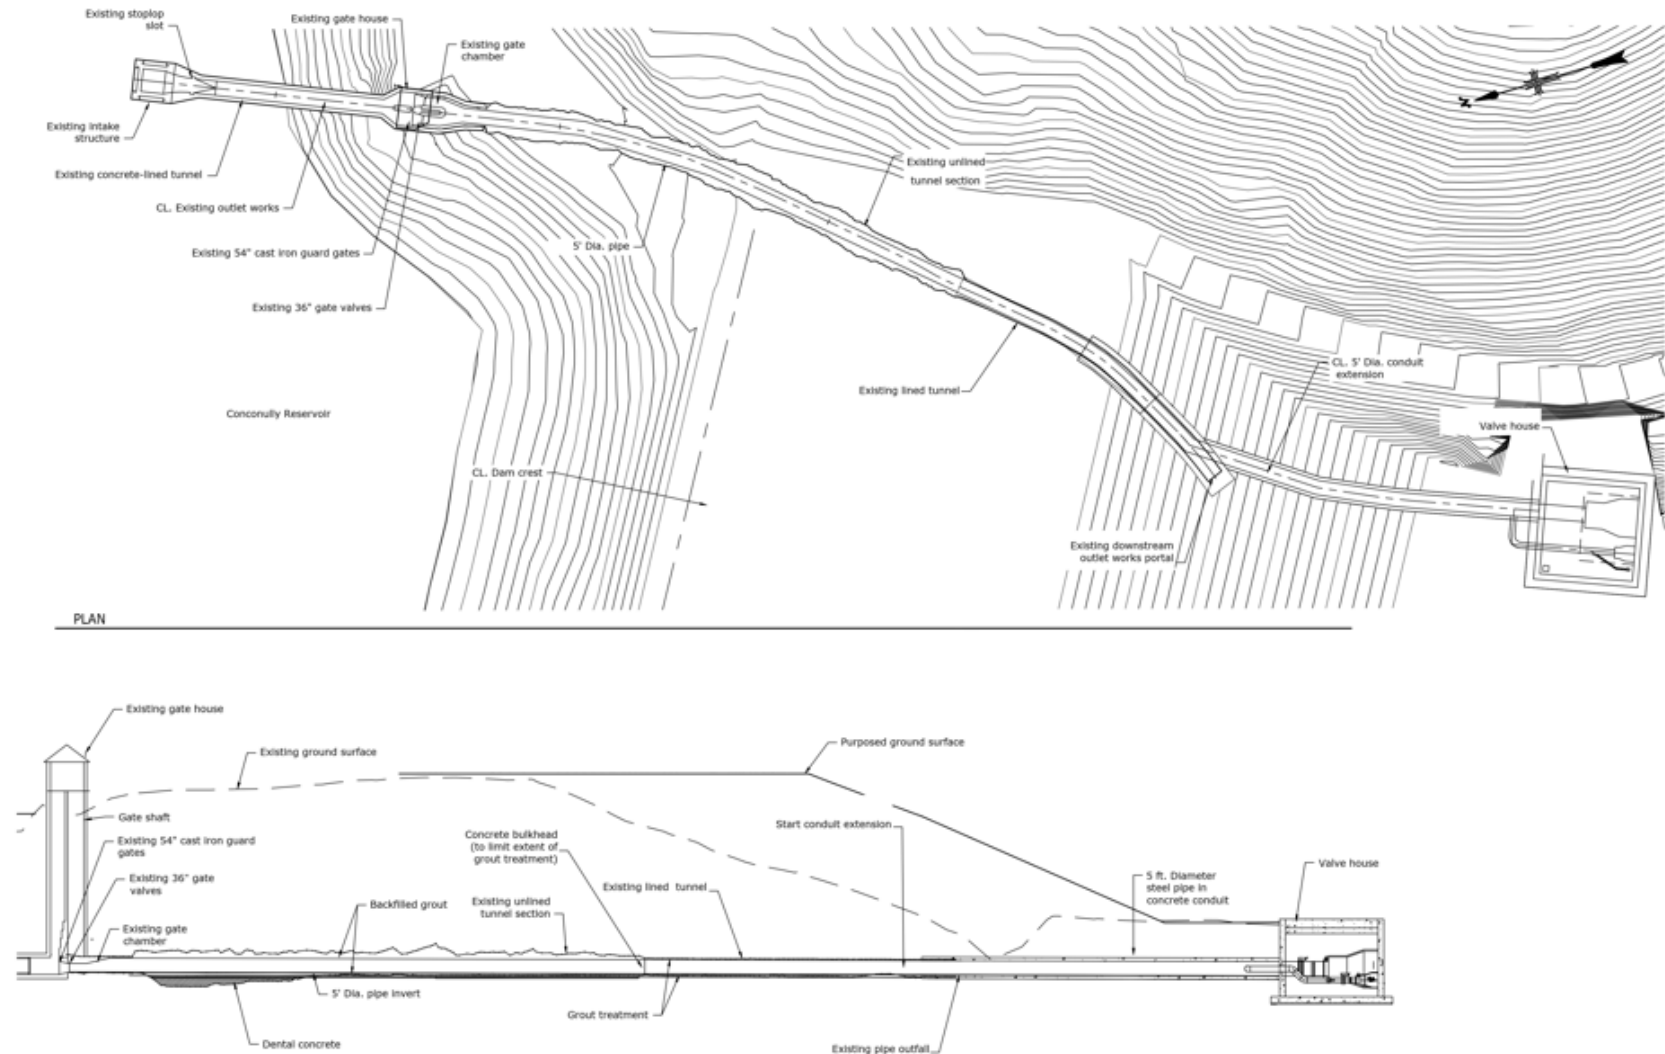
Overview and profile of Alternative C outlet works – west alignment
